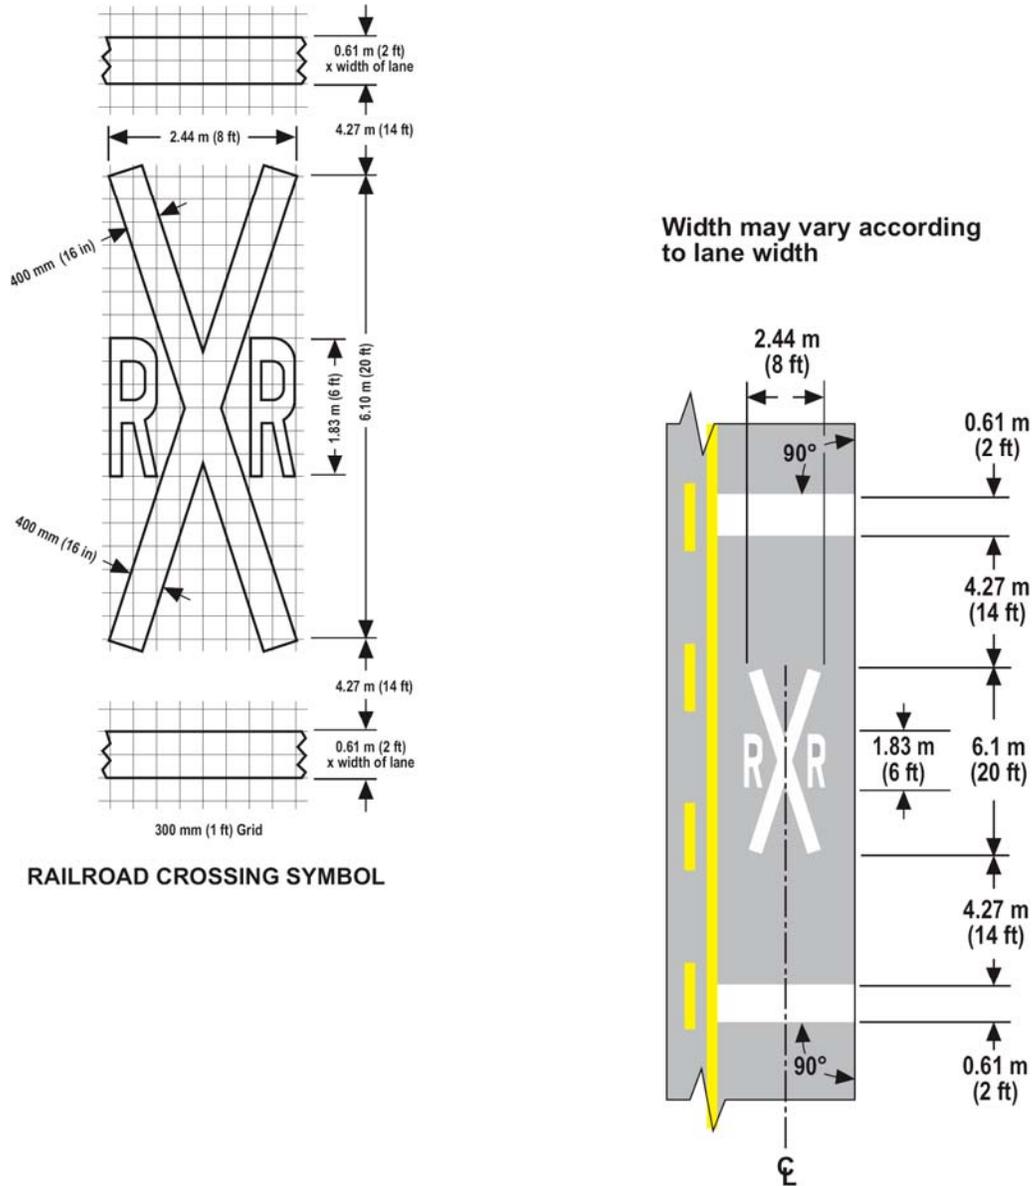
B-6 (CA). Example of Placement of Warning Signs and Pavement Markings at Highway-Rail Grade Crossings (Sheet 4 of 4)
